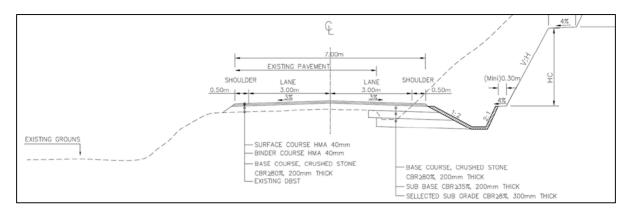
Cross Section Non-village and Mountainous Area (TC4)
